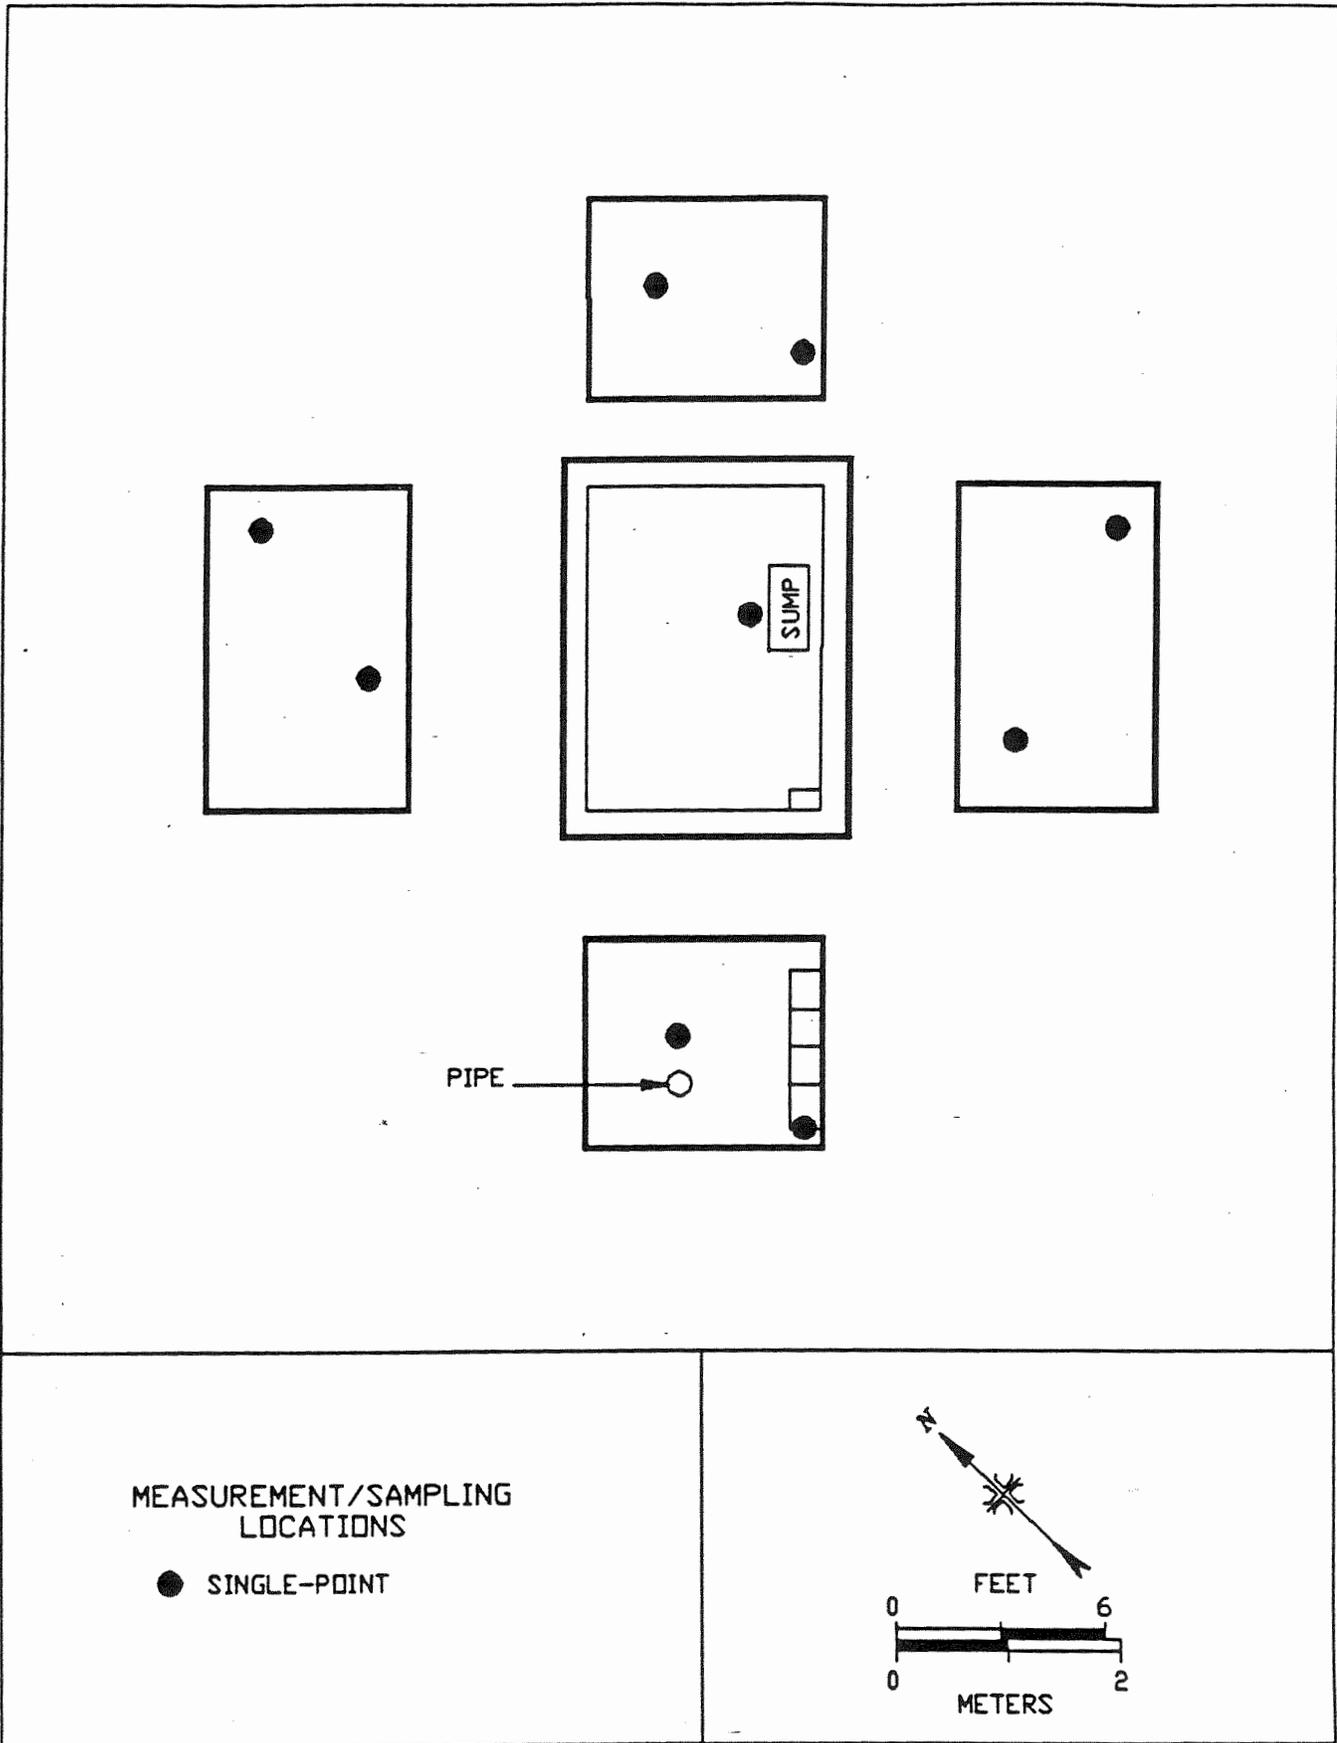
Building 023, Rad-Waste Tank Vault - Measurement and Sampling Locations
